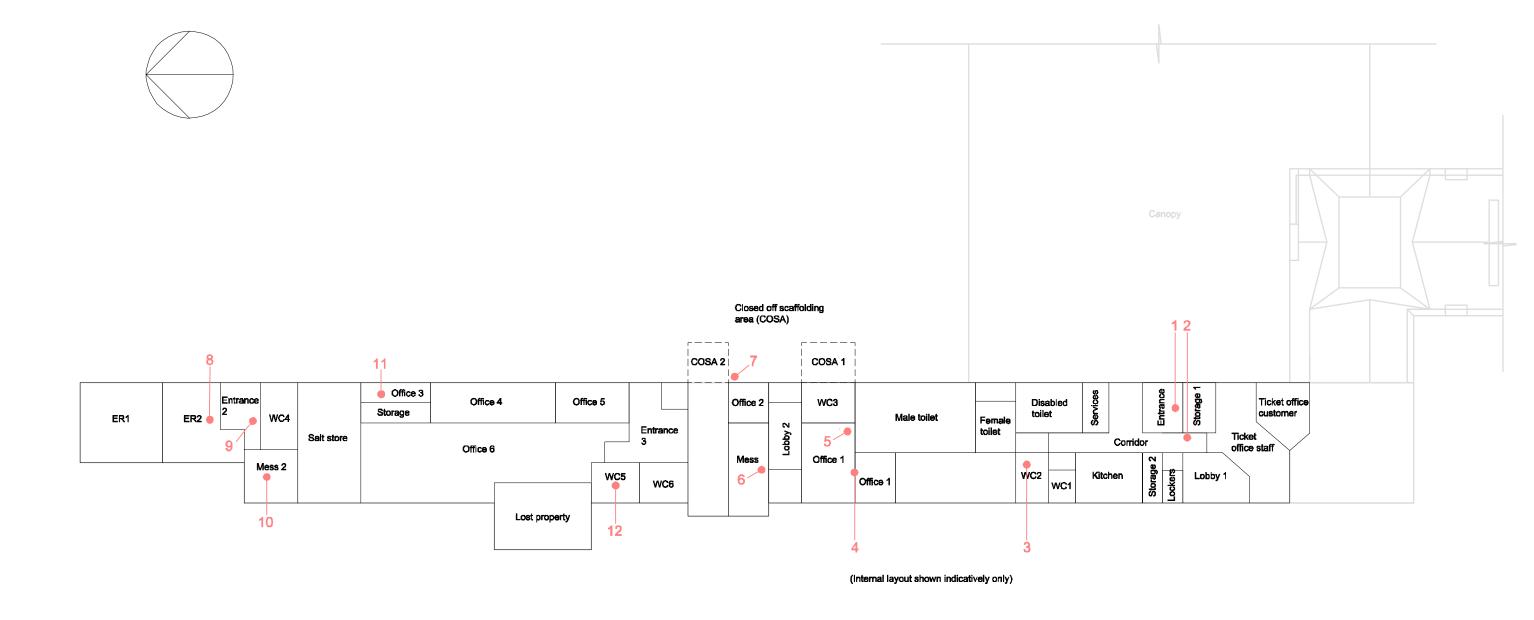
Plan of Station Hotel Building South Block Basement showing Internal Survey Defect/Observation Locations
